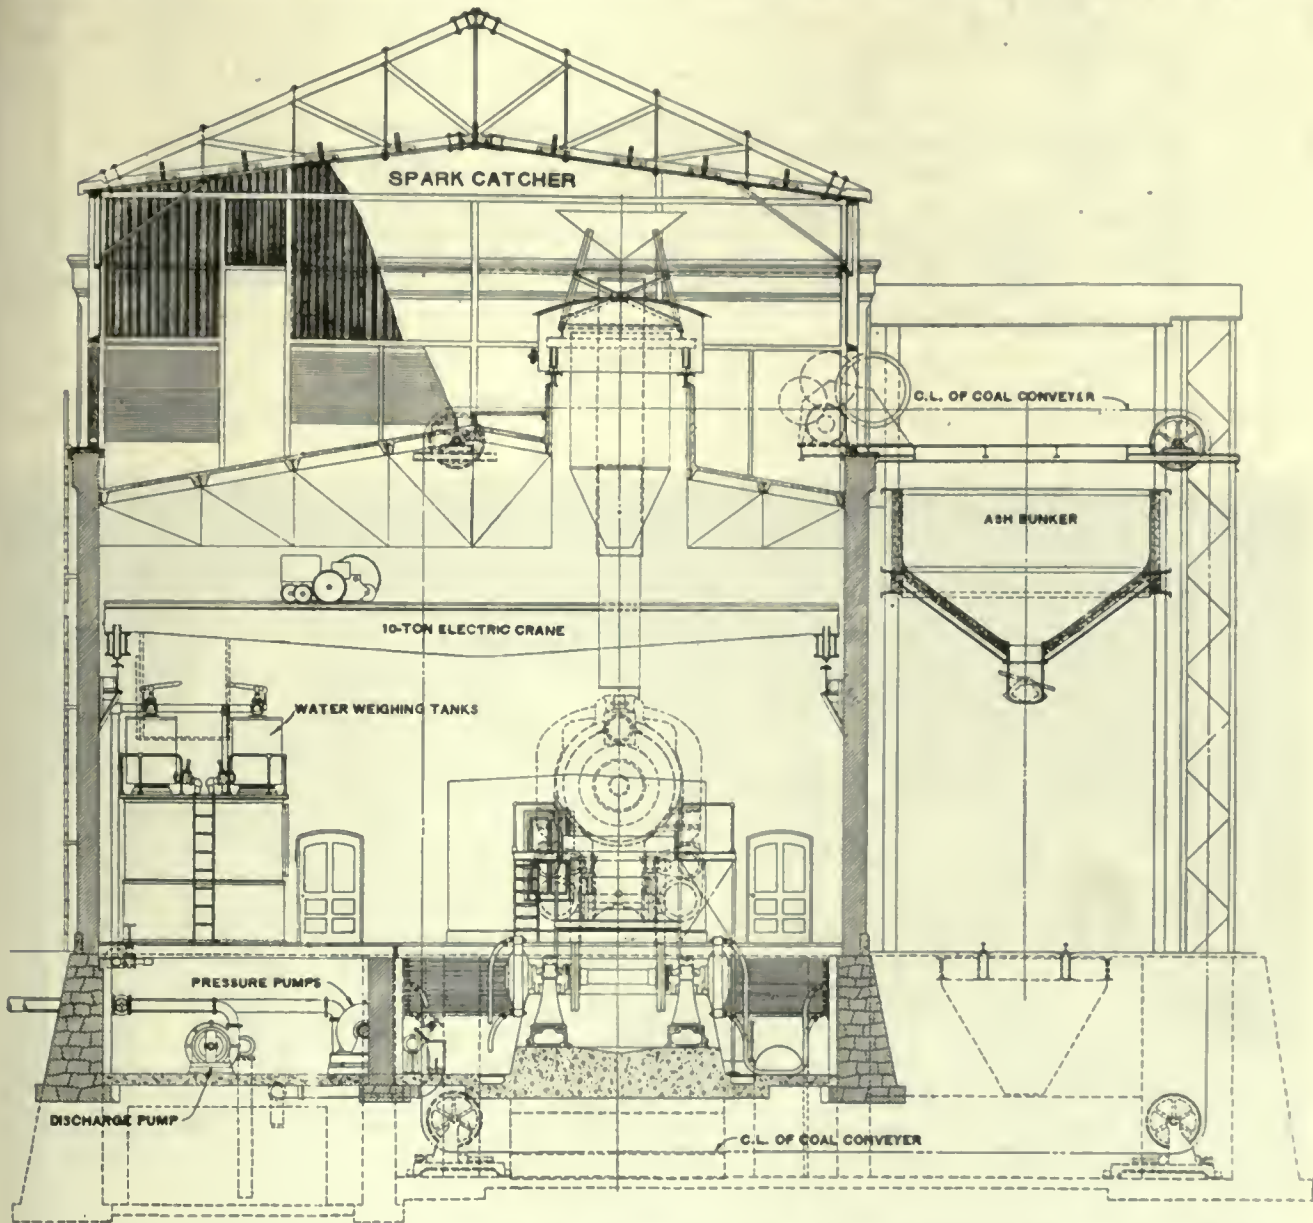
CROSS-SECTION OF LOCOMOTIVE TESTING PLANT OF THE PENNSYLVANIA RAILROAD AT ALTOONA, PA.
